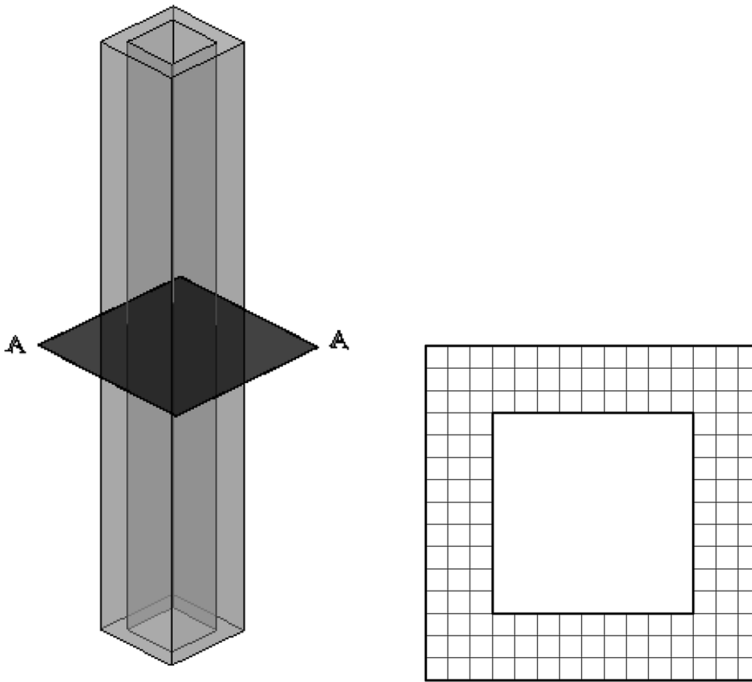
Modeling the masonry towers using the Equivalent Beam Element with fiber section
